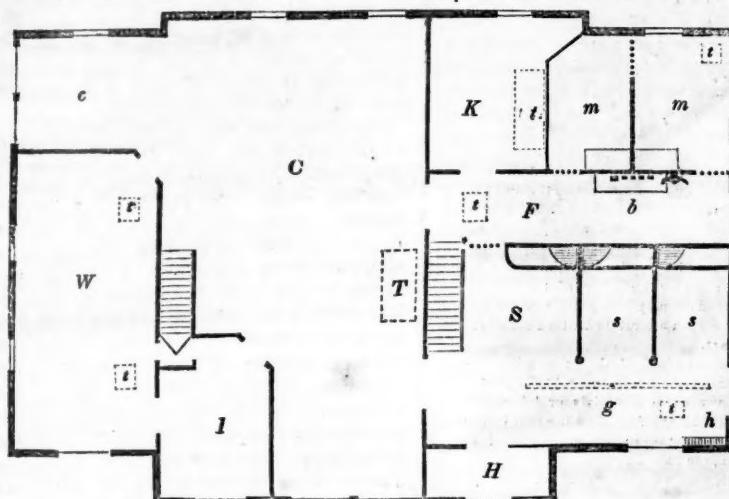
PLAN OF MAIN OR GROUND FLOOR.
